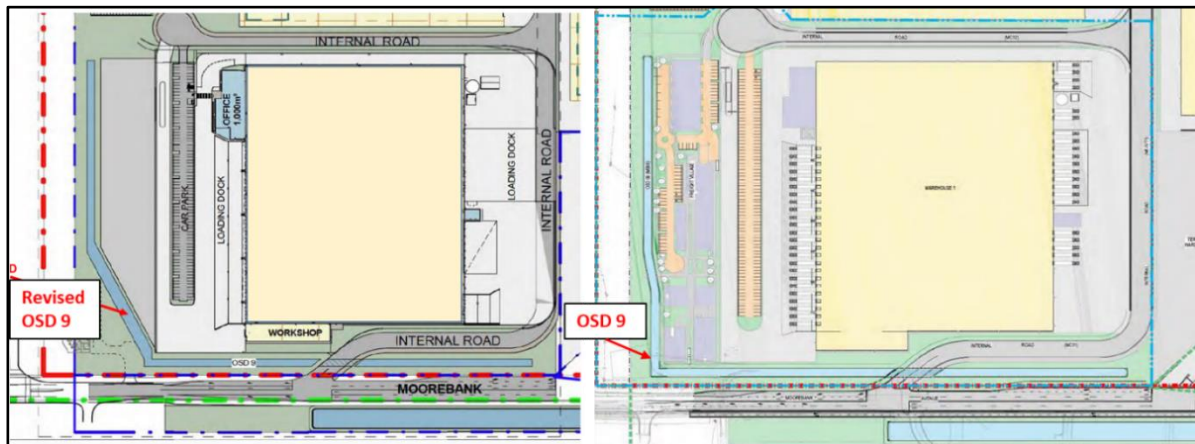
| OSD 9 layout, proposed (left) and original (right) (Source: Applicant's Modification Report)
